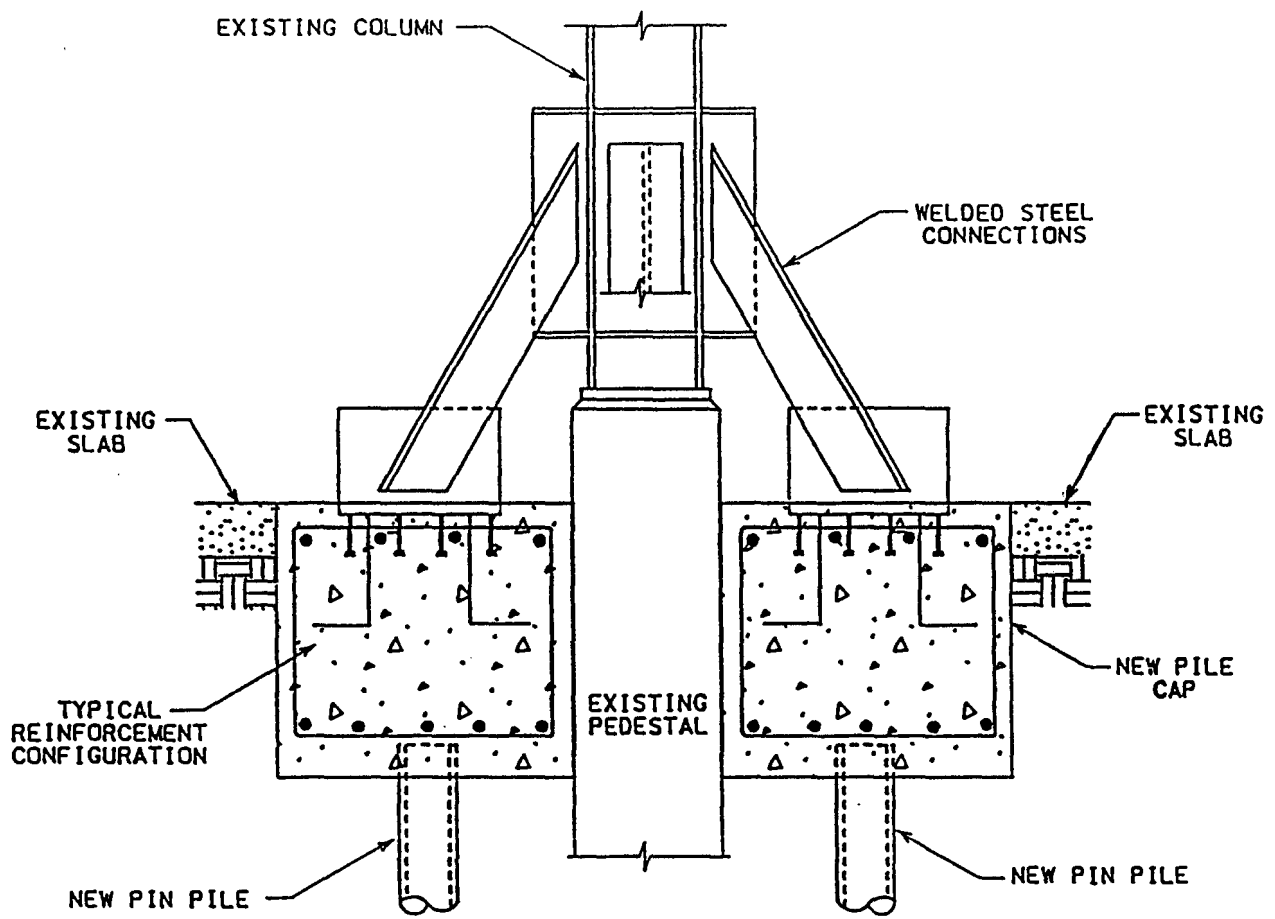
Typical connection between new cap and existing column, Mobile, Alabama (Bruce et al., 1992).
